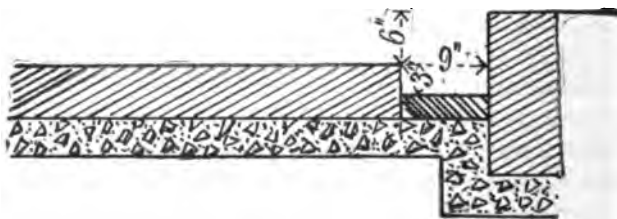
SECTION OF CROSSING SHOWING GUTTER PAVED WITH A SINGLE STONE.
